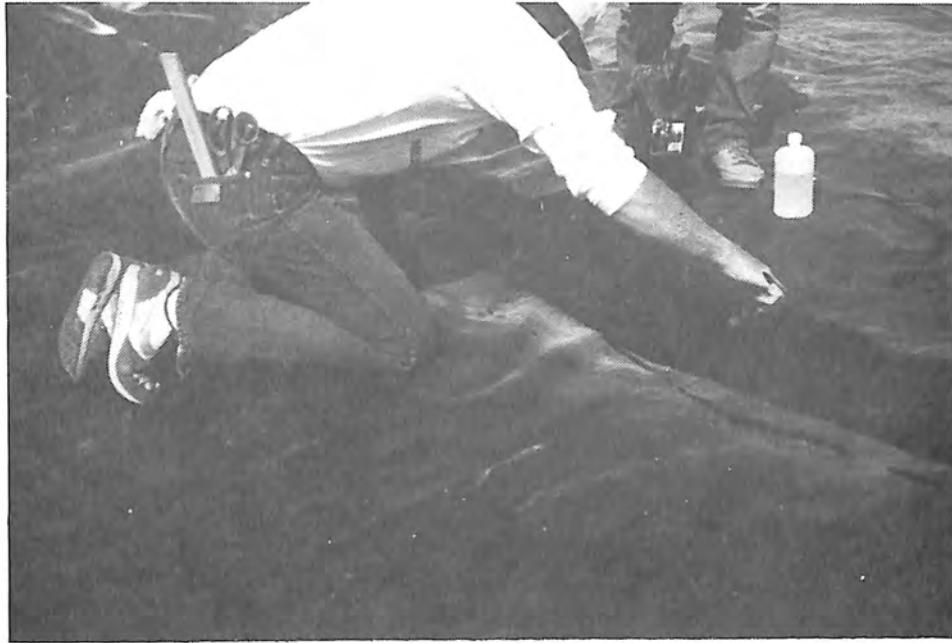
Crew installs geotextile on canal bottom and side slopes.
